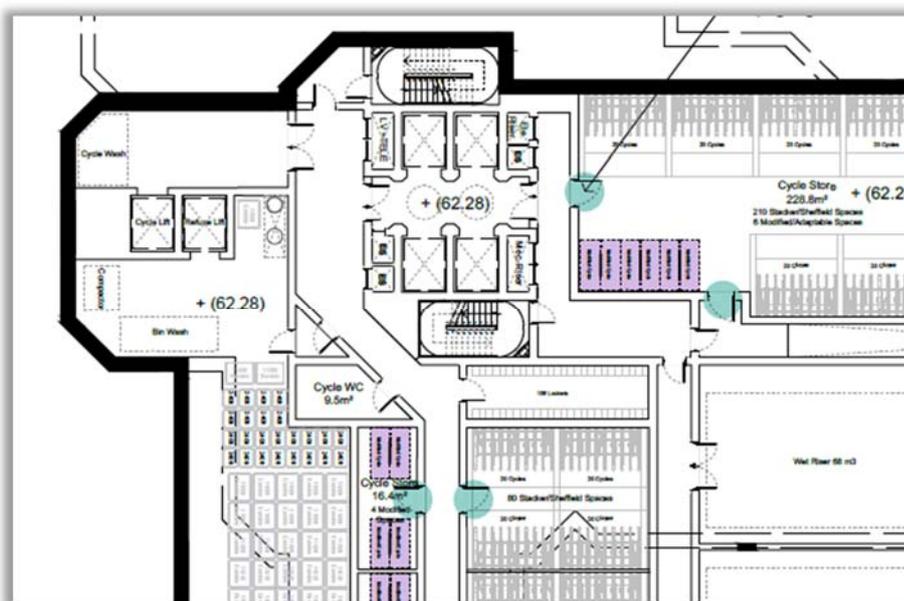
basement plan of northeast corner showing dedicated cycle lift
